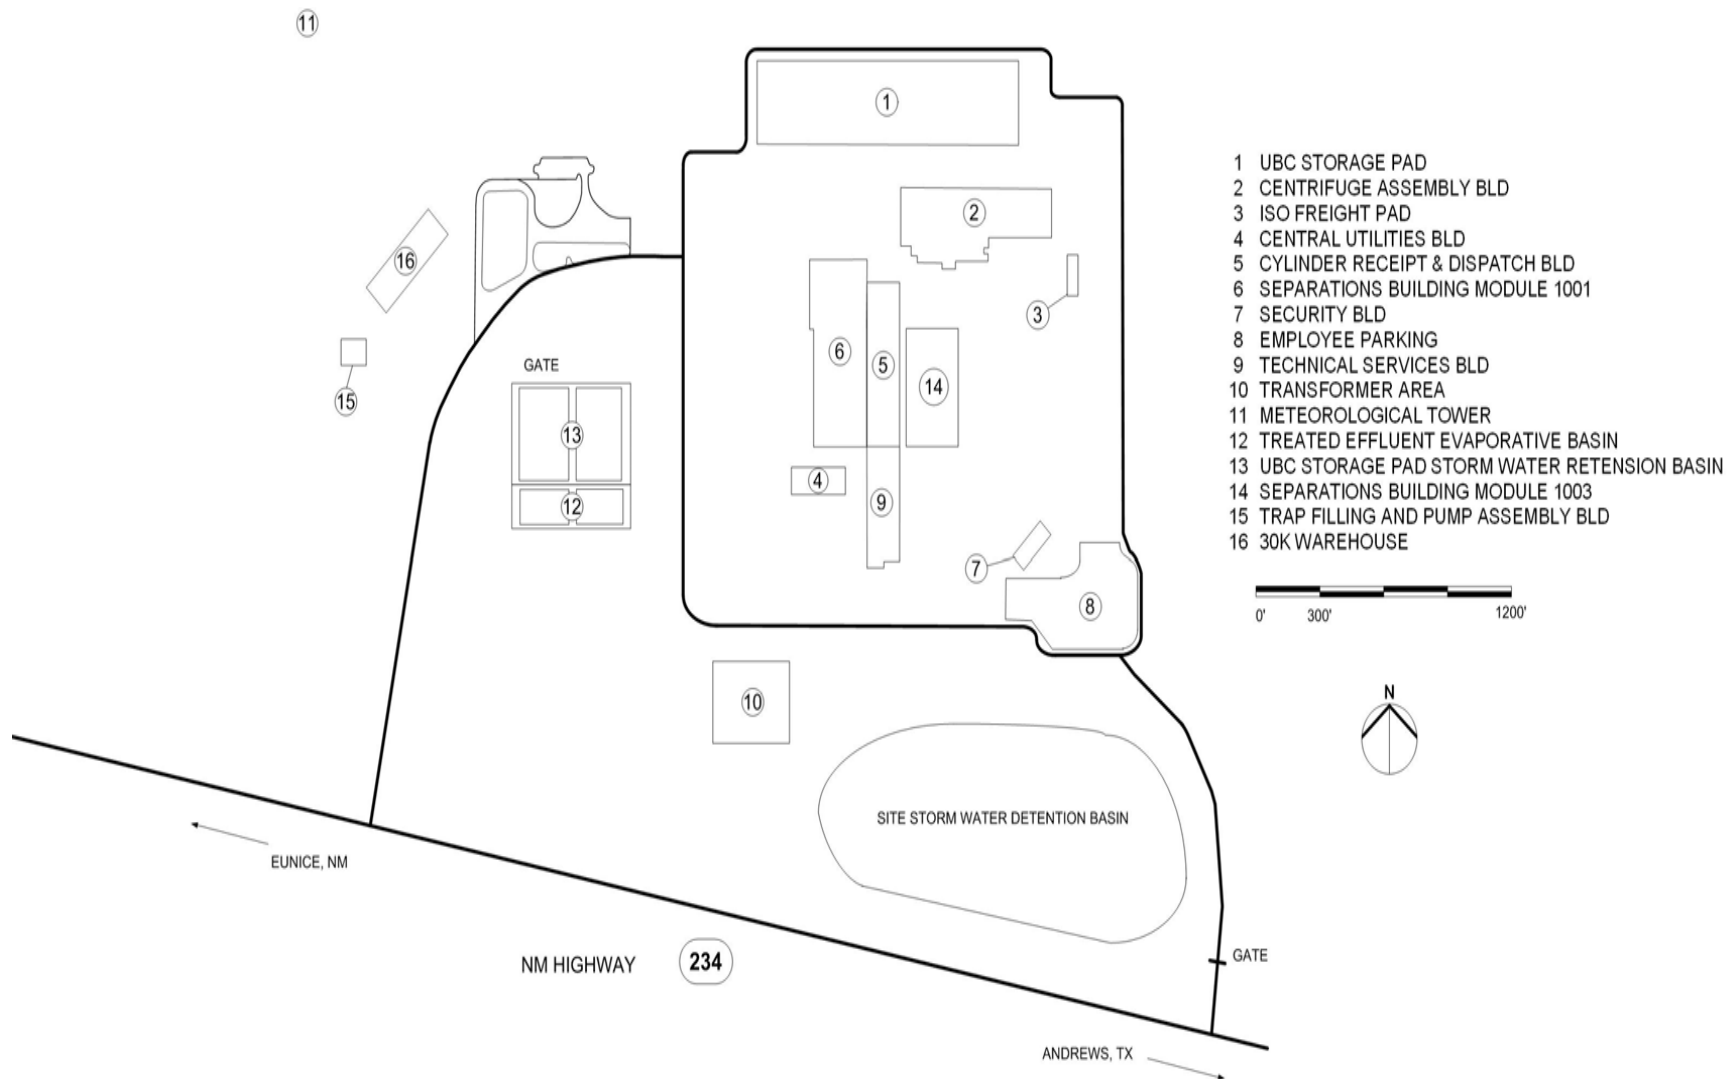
Site Plan with Stormwater Detention/Retention Basins
